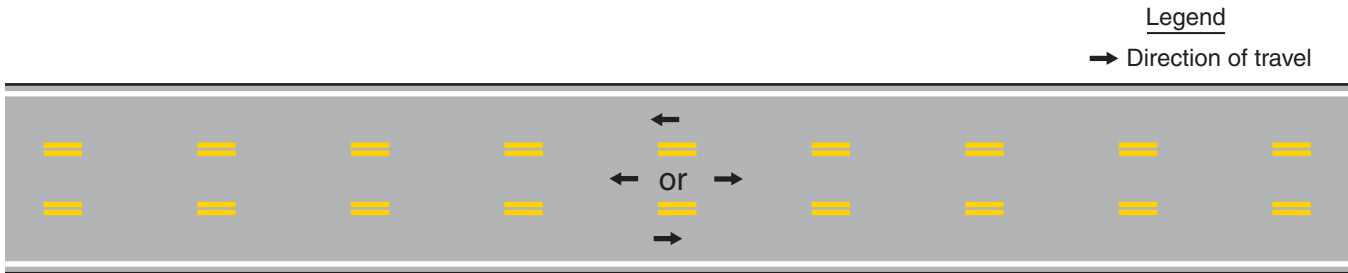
B-6. Example of Reversible Lane Marking ApplicationSection 3B.04 White Lane Line Pavement Markings and WarrantsStandard:
